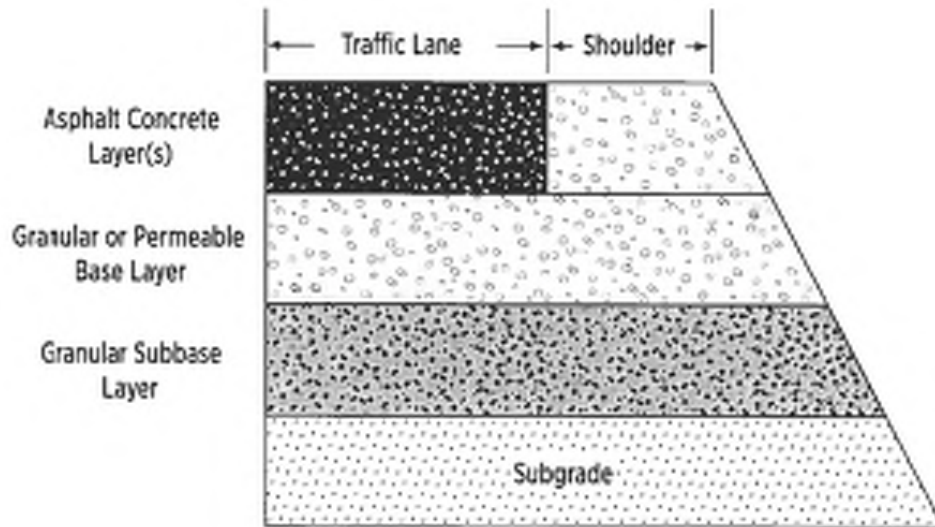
Typical Cross Section of a Rural Conventional Asphalt Concrete Pavement (TAC, 2013)
